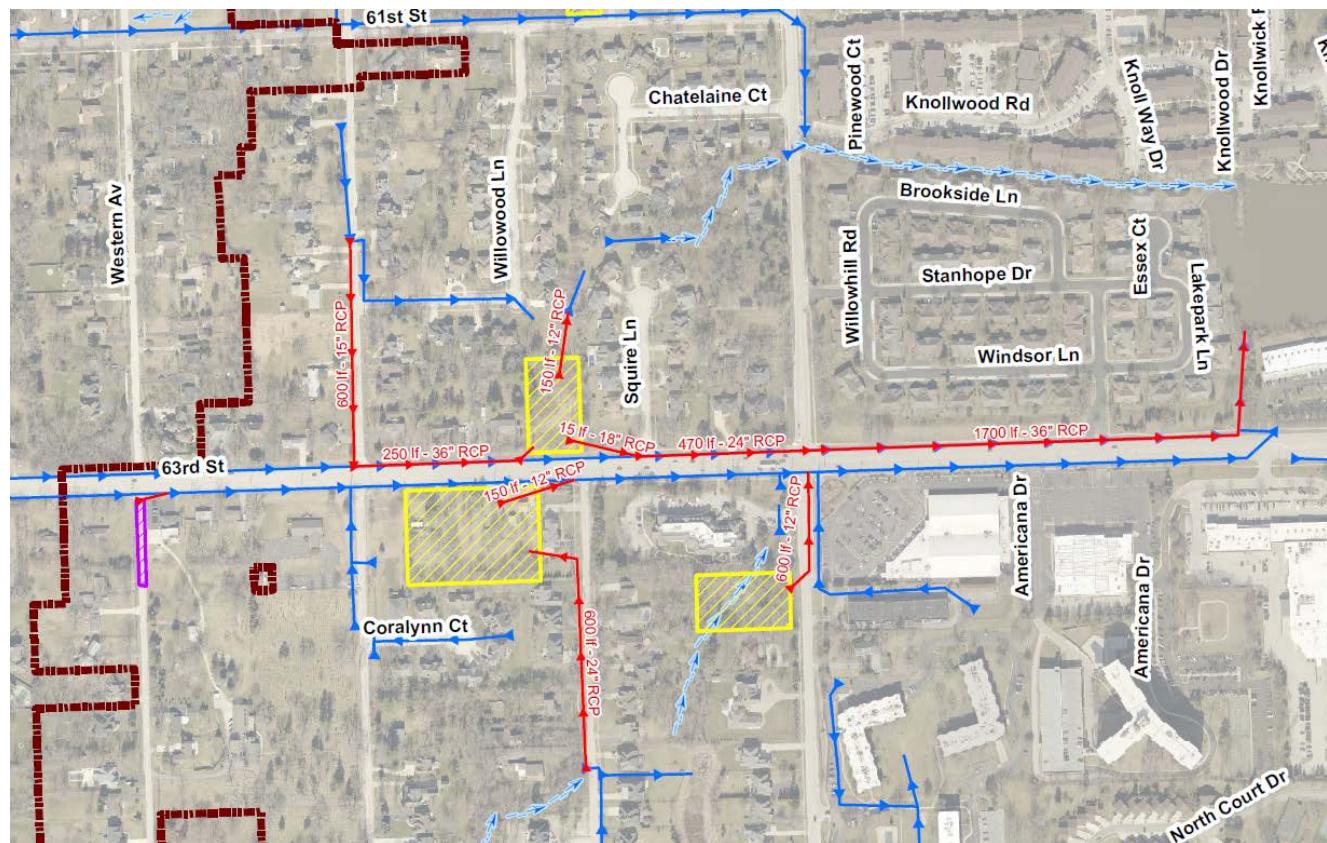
Northwest Area – Proposed Conditions (South of 61st Street)
